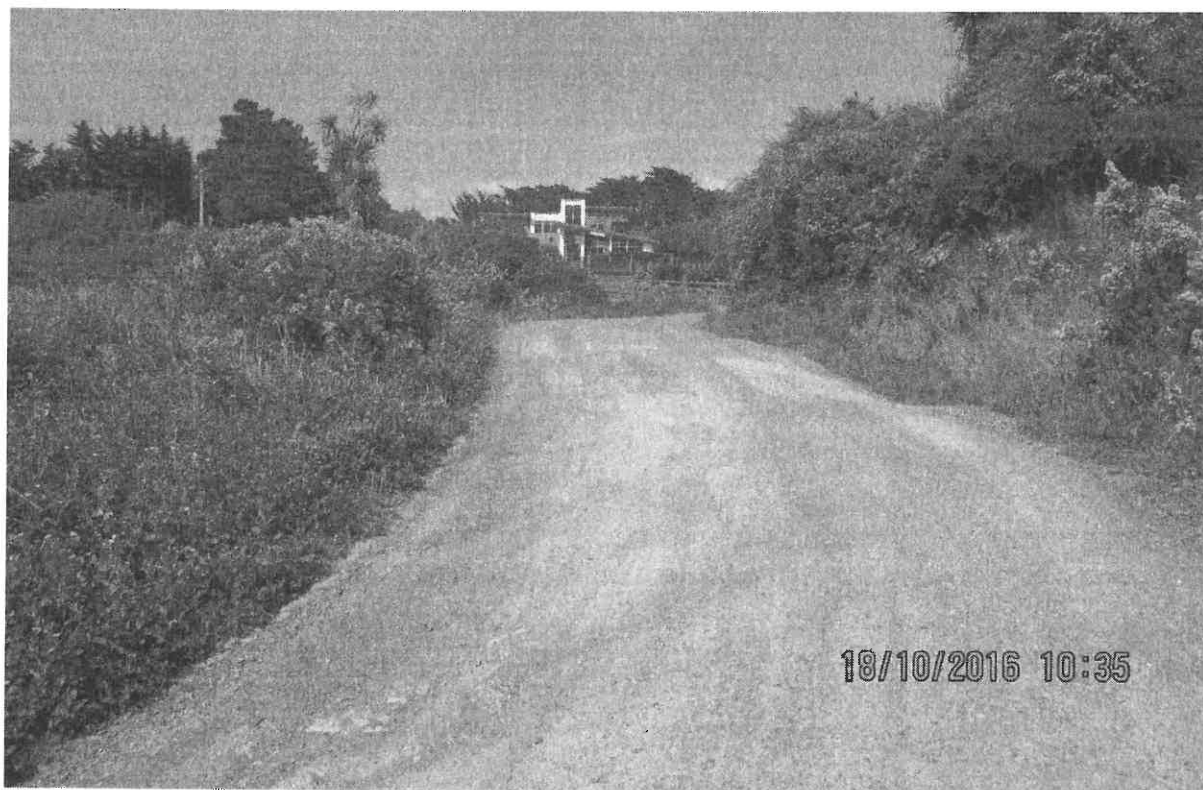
At the bend, looking up hill towards the house of 111F Cliffs Road.
